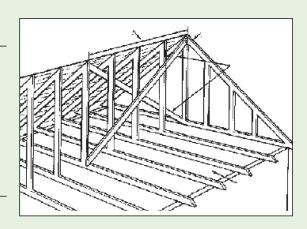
In this application of lateral bracing, the 2 x 4's are 18 inches from the ridge and connect to horizontal members that attach the opposing trusses. Not all roofs will have the horizontal members. The 2 x 4's are connected with two #14 3-inch screws (A) and overlap over two trusses (A and B). The end is connected to the gable end with an angle or L bracket (C).
